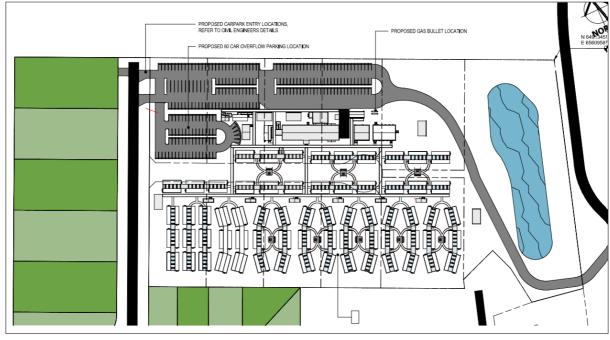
Site Plan. Source: Andre Melville Building Design October 2024
